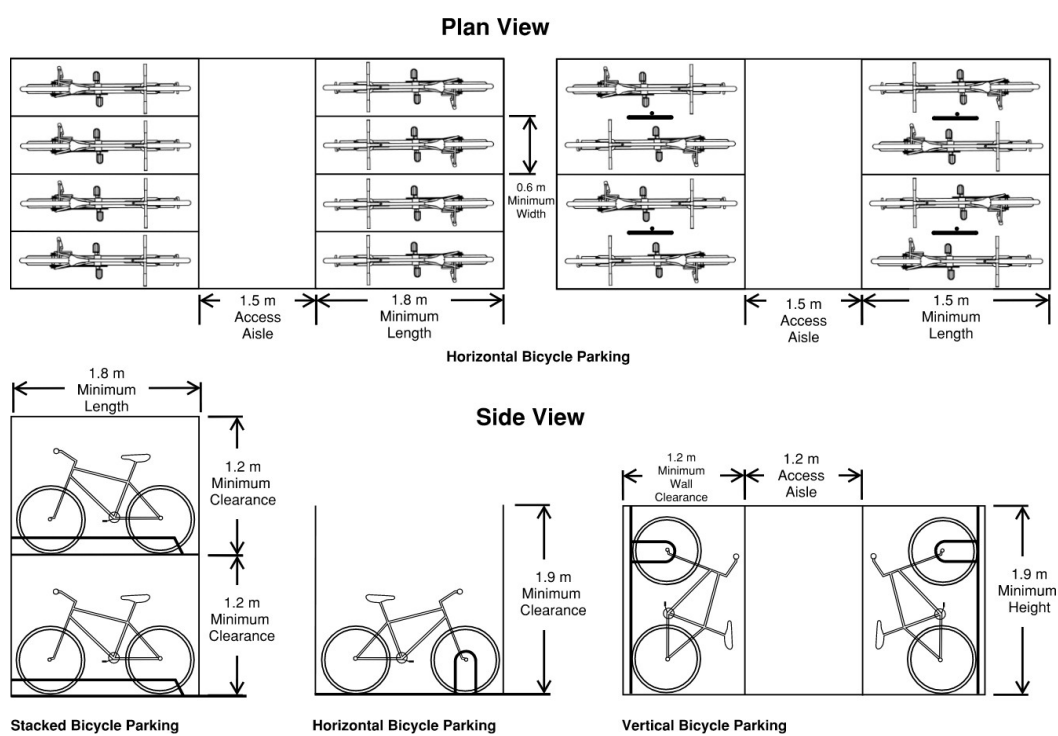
Plan and side views of horizontal, vertical, and stacked bicycle space dimensions.
